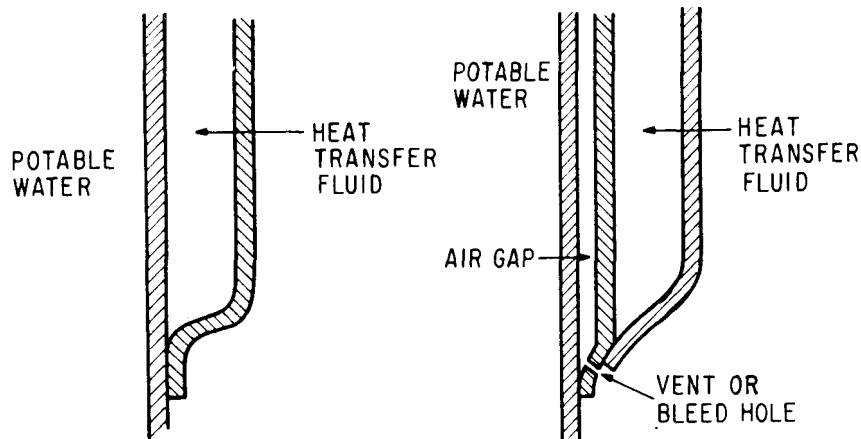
Wraparound-Shell Heat Exchangers in Cross-Section
